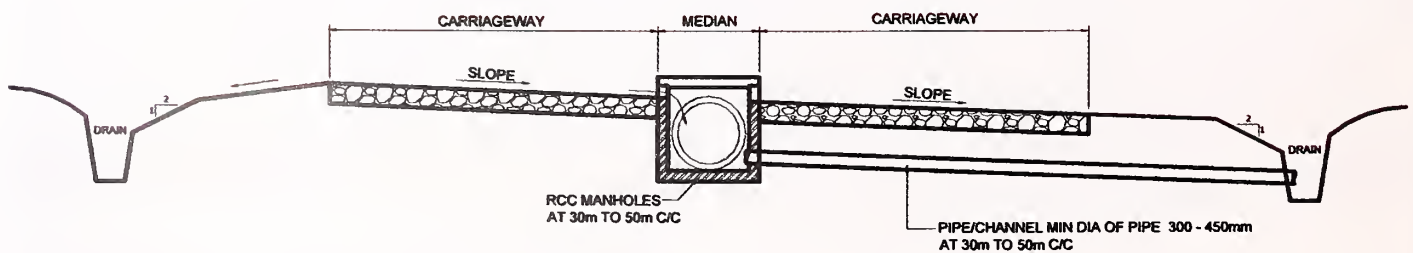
Buried RCC Pipe Provided for Median Drainage
